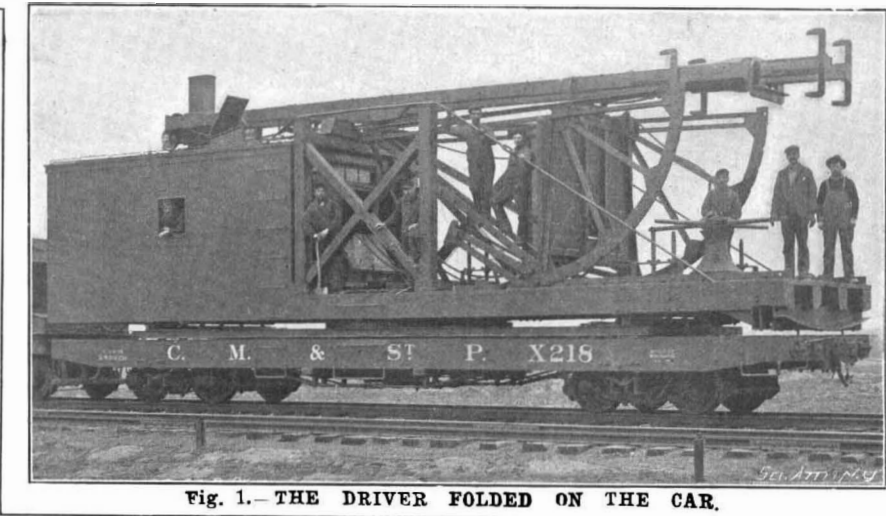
THE DRIVER FOLDED ON THE CAR.
